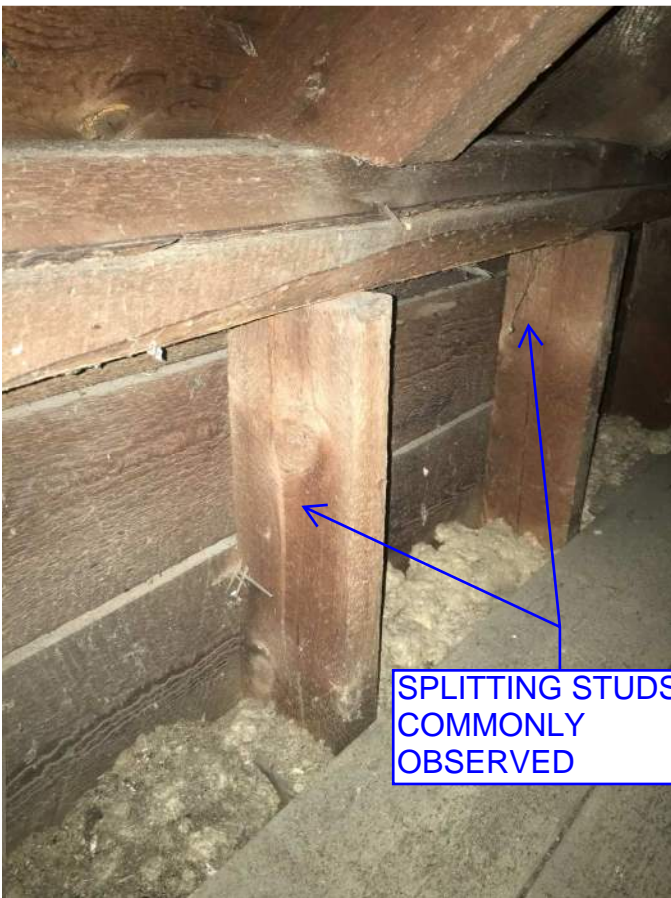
SPLITTING AT TOP OF WALL STUD
